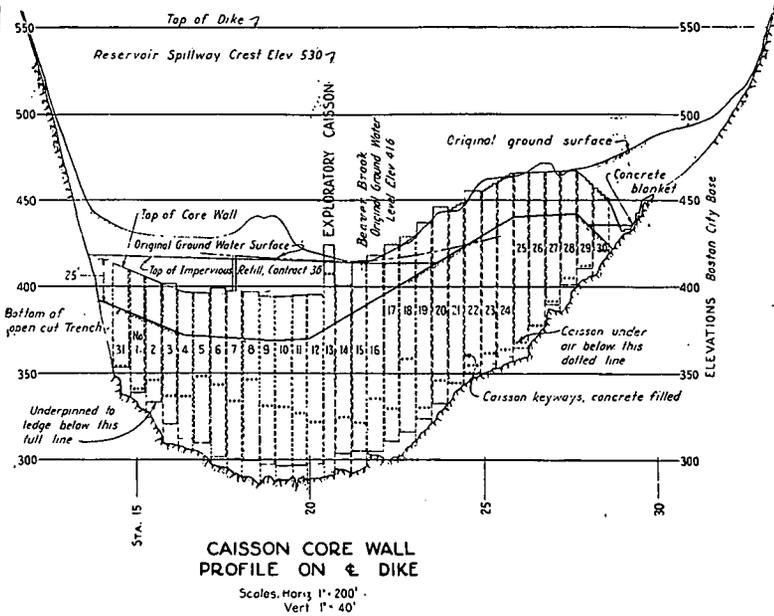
PROFILE ON CENTER LINE OF DIKE
